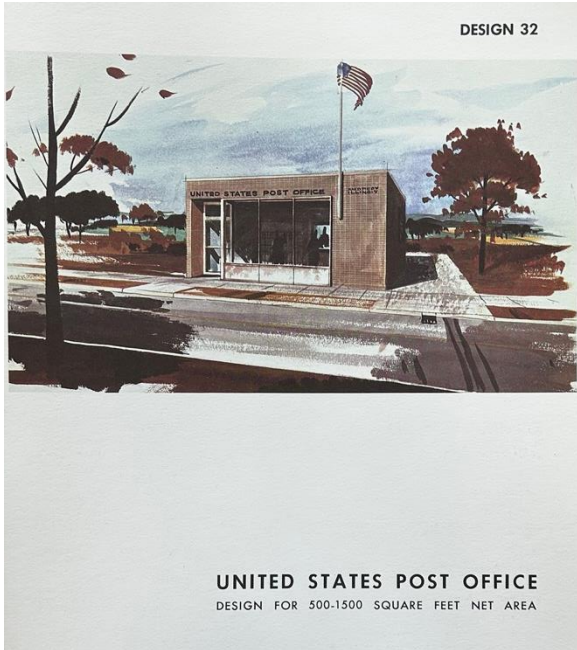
Thousand Series design drawing from Building Design Guidelines. Design 32 is a minimal design with most of the ornamentation revolving around the use of blond running bond brick veneer on the front elevation with a large portion of the front façade being a window wall. A unique feature on Design plate 32 is the attached flagpole. (USPS Corporate Library, 1959).
